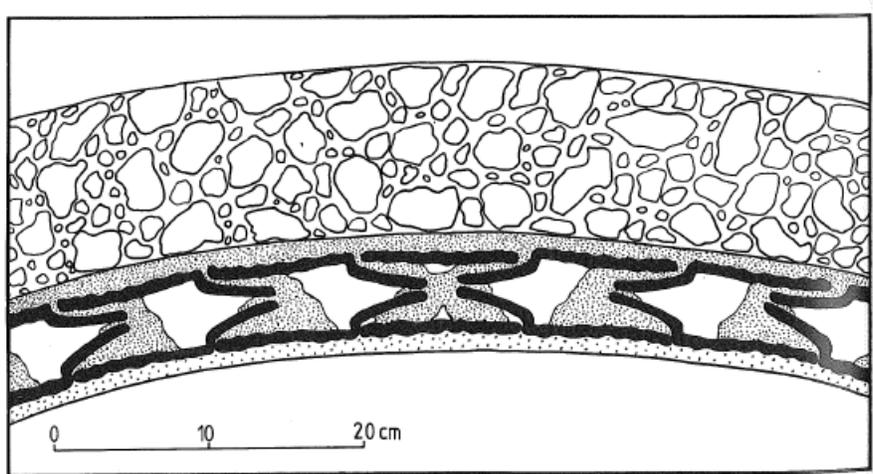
Hypothetical section of vault constructed with vaulting tubes and rubble-concrete above.
